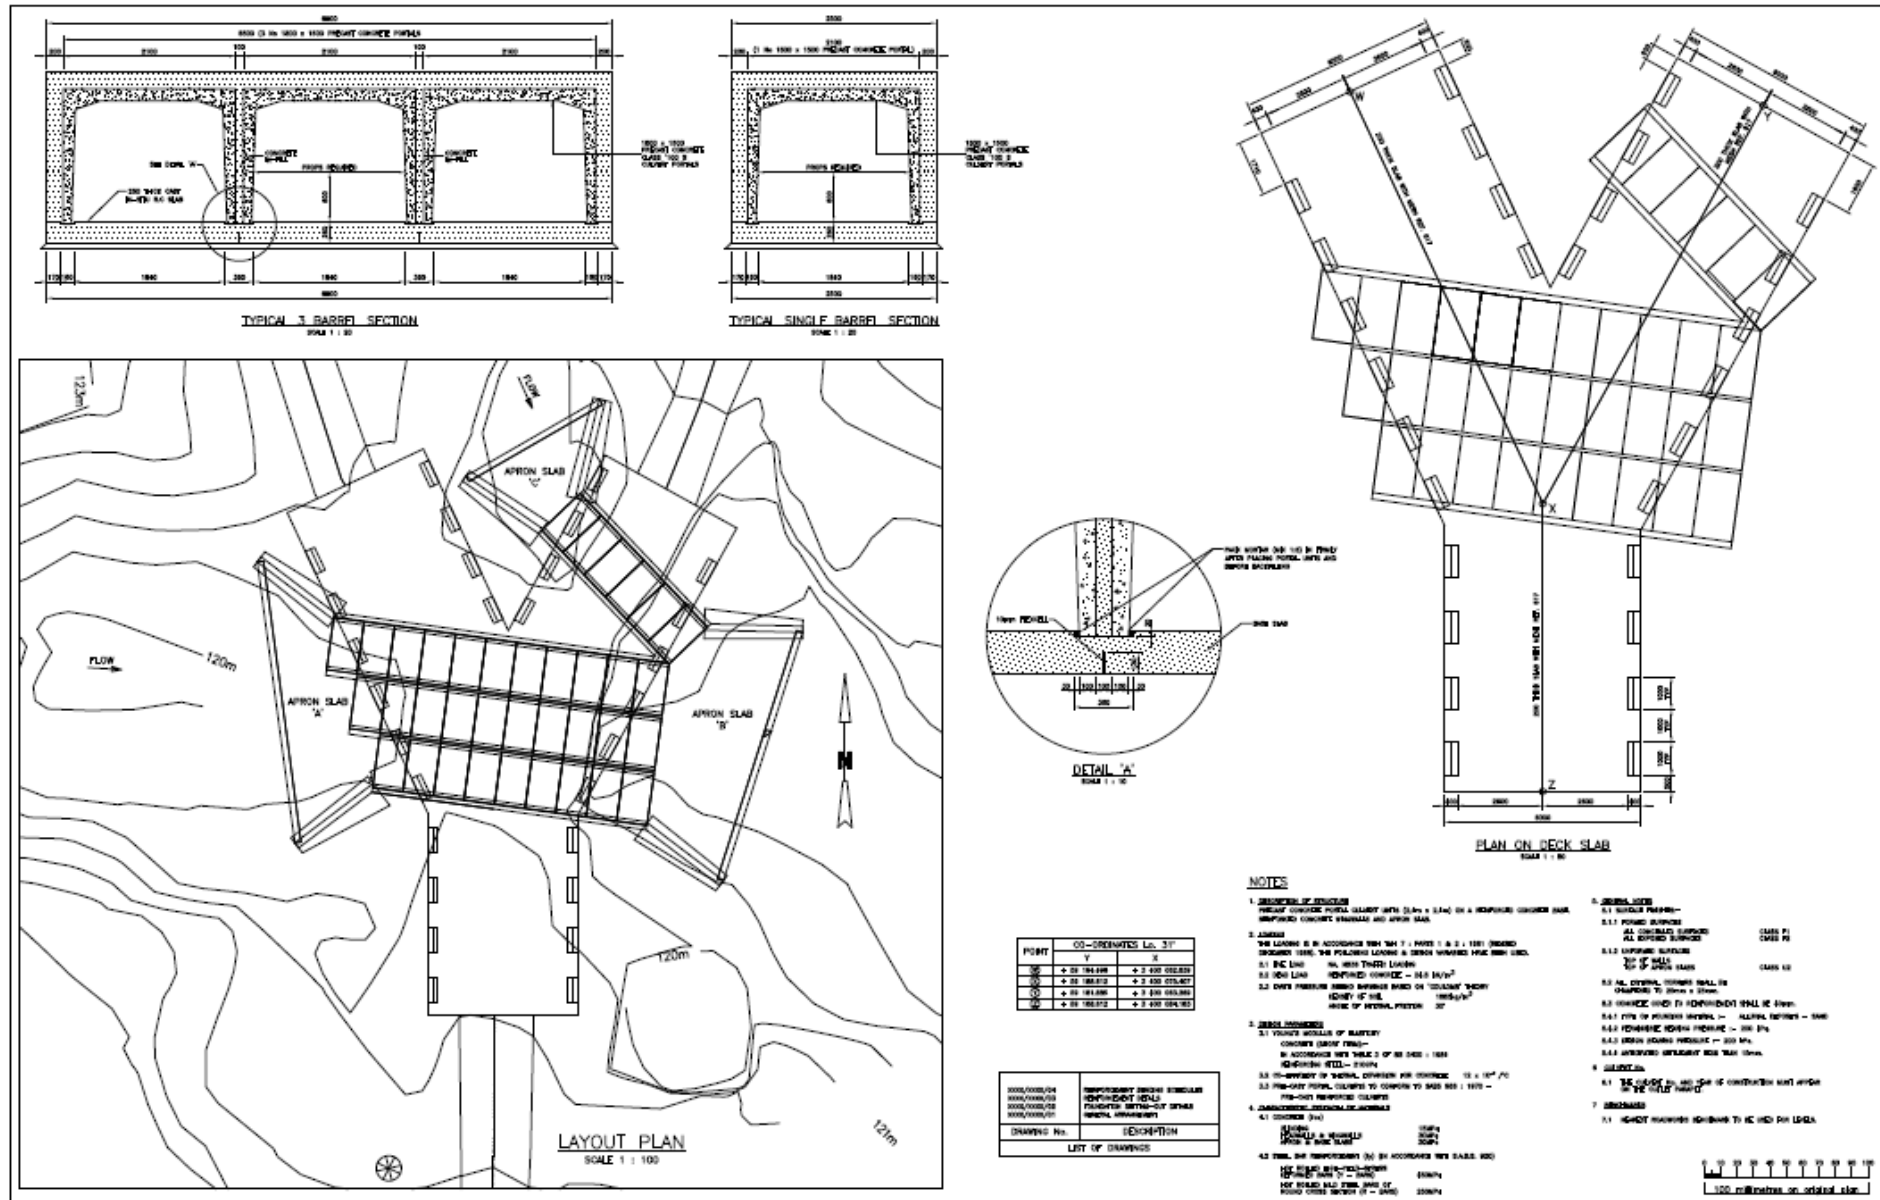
Proposed Mdlazi Portal Culvert Bridge Layout Plan
